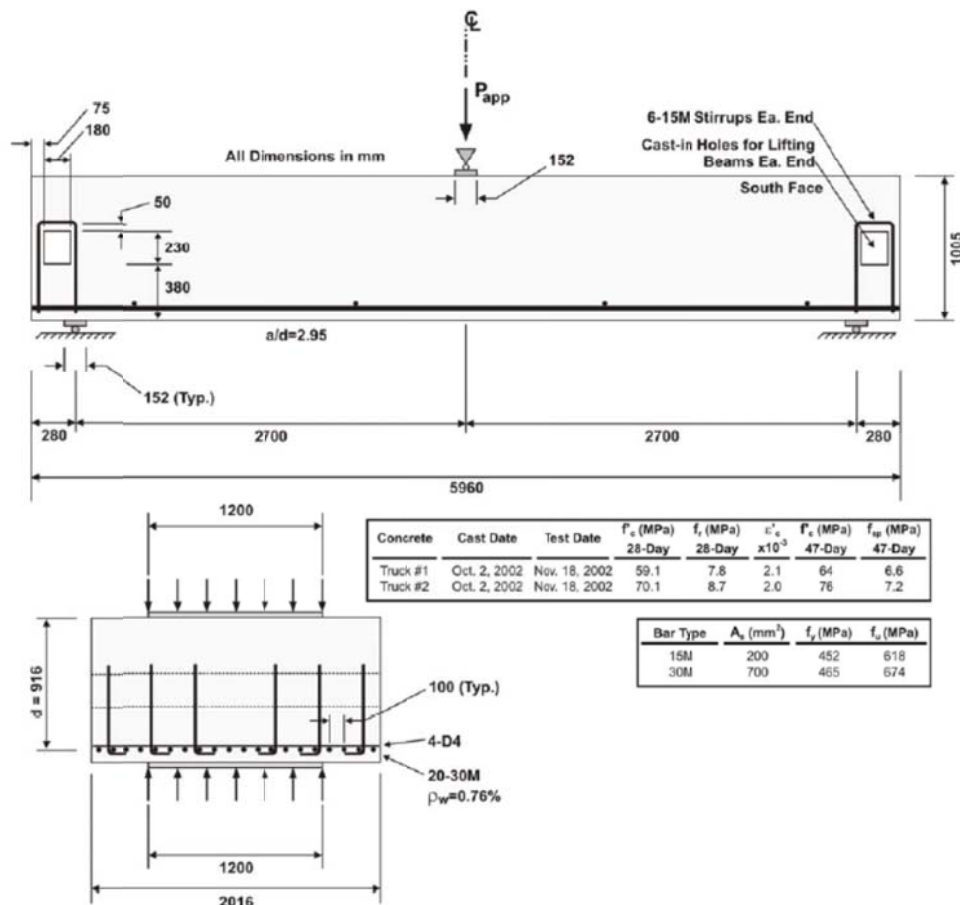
Test specimen AT-1 (Sherwood, 2008).
